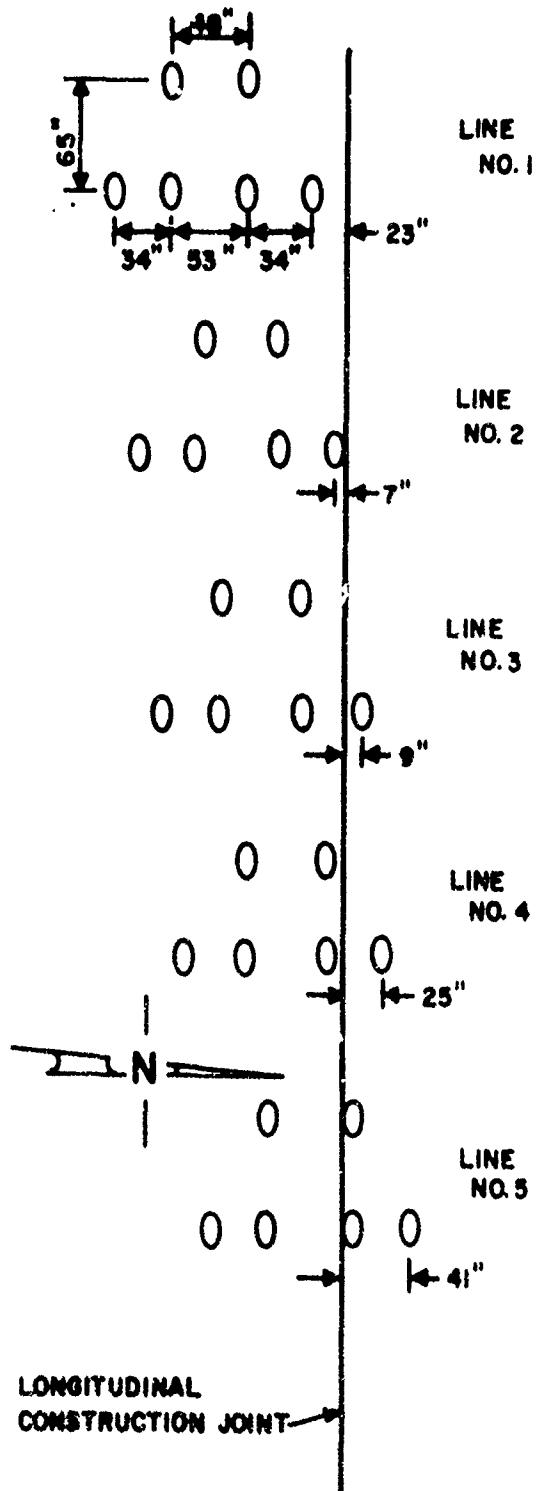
Traffic patterns for the C 5A wheel assembly, rigid pavement test section.
